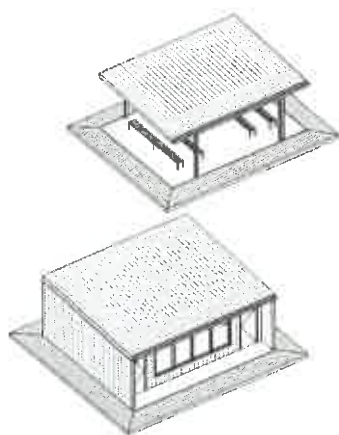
New Mask Testing Facility and Training Shelter Floor Plan
